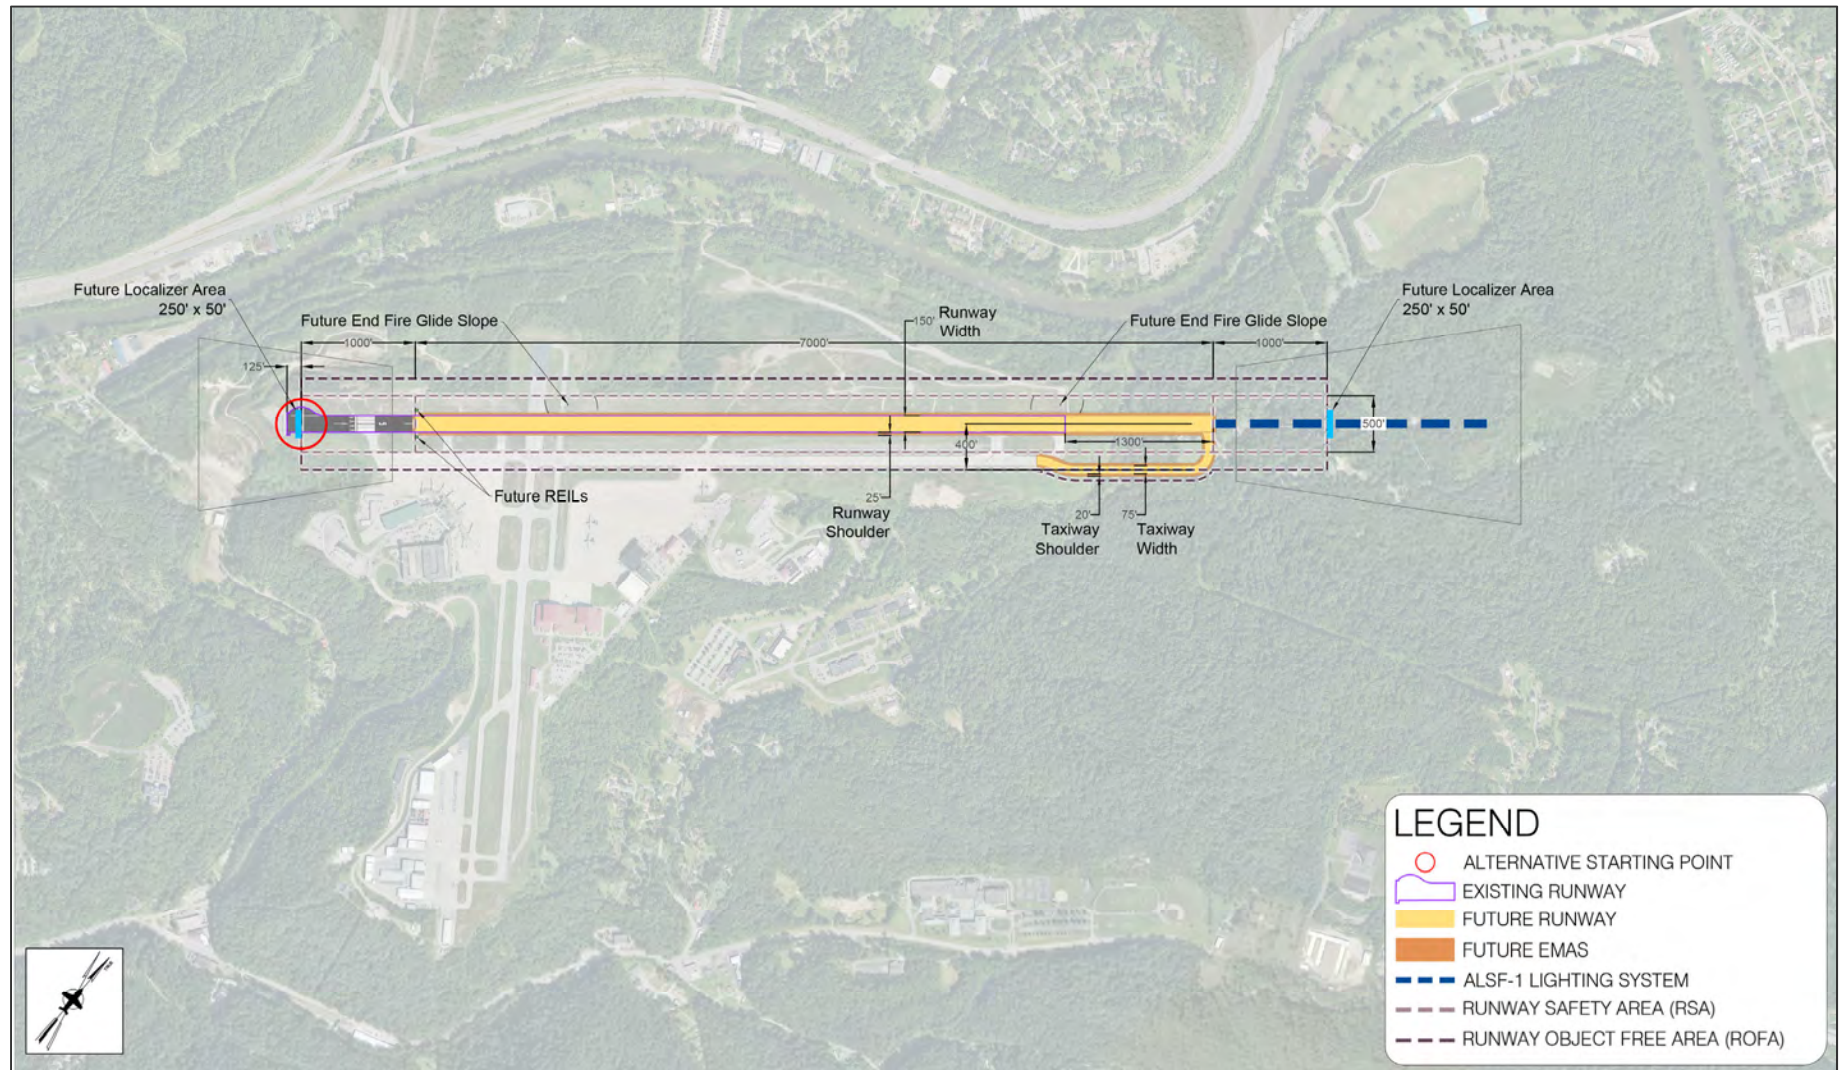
RECOMMENDED DEVELOPMENT PLAN
